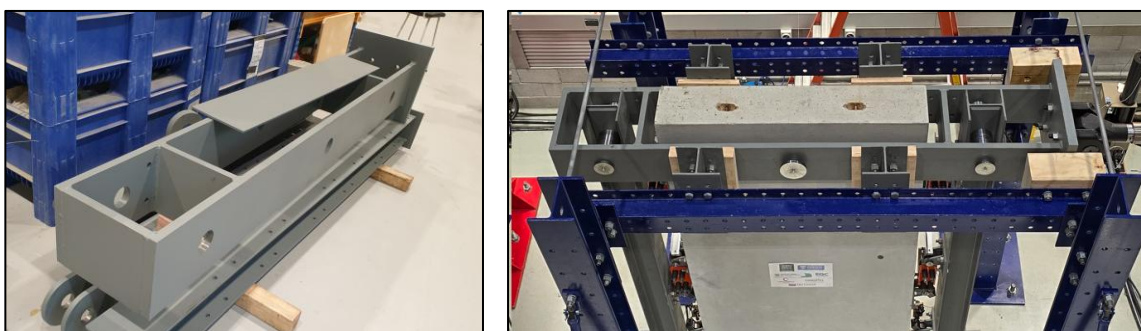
Loading beam designed to pull-push the wall and adjacent columns with pin connections
